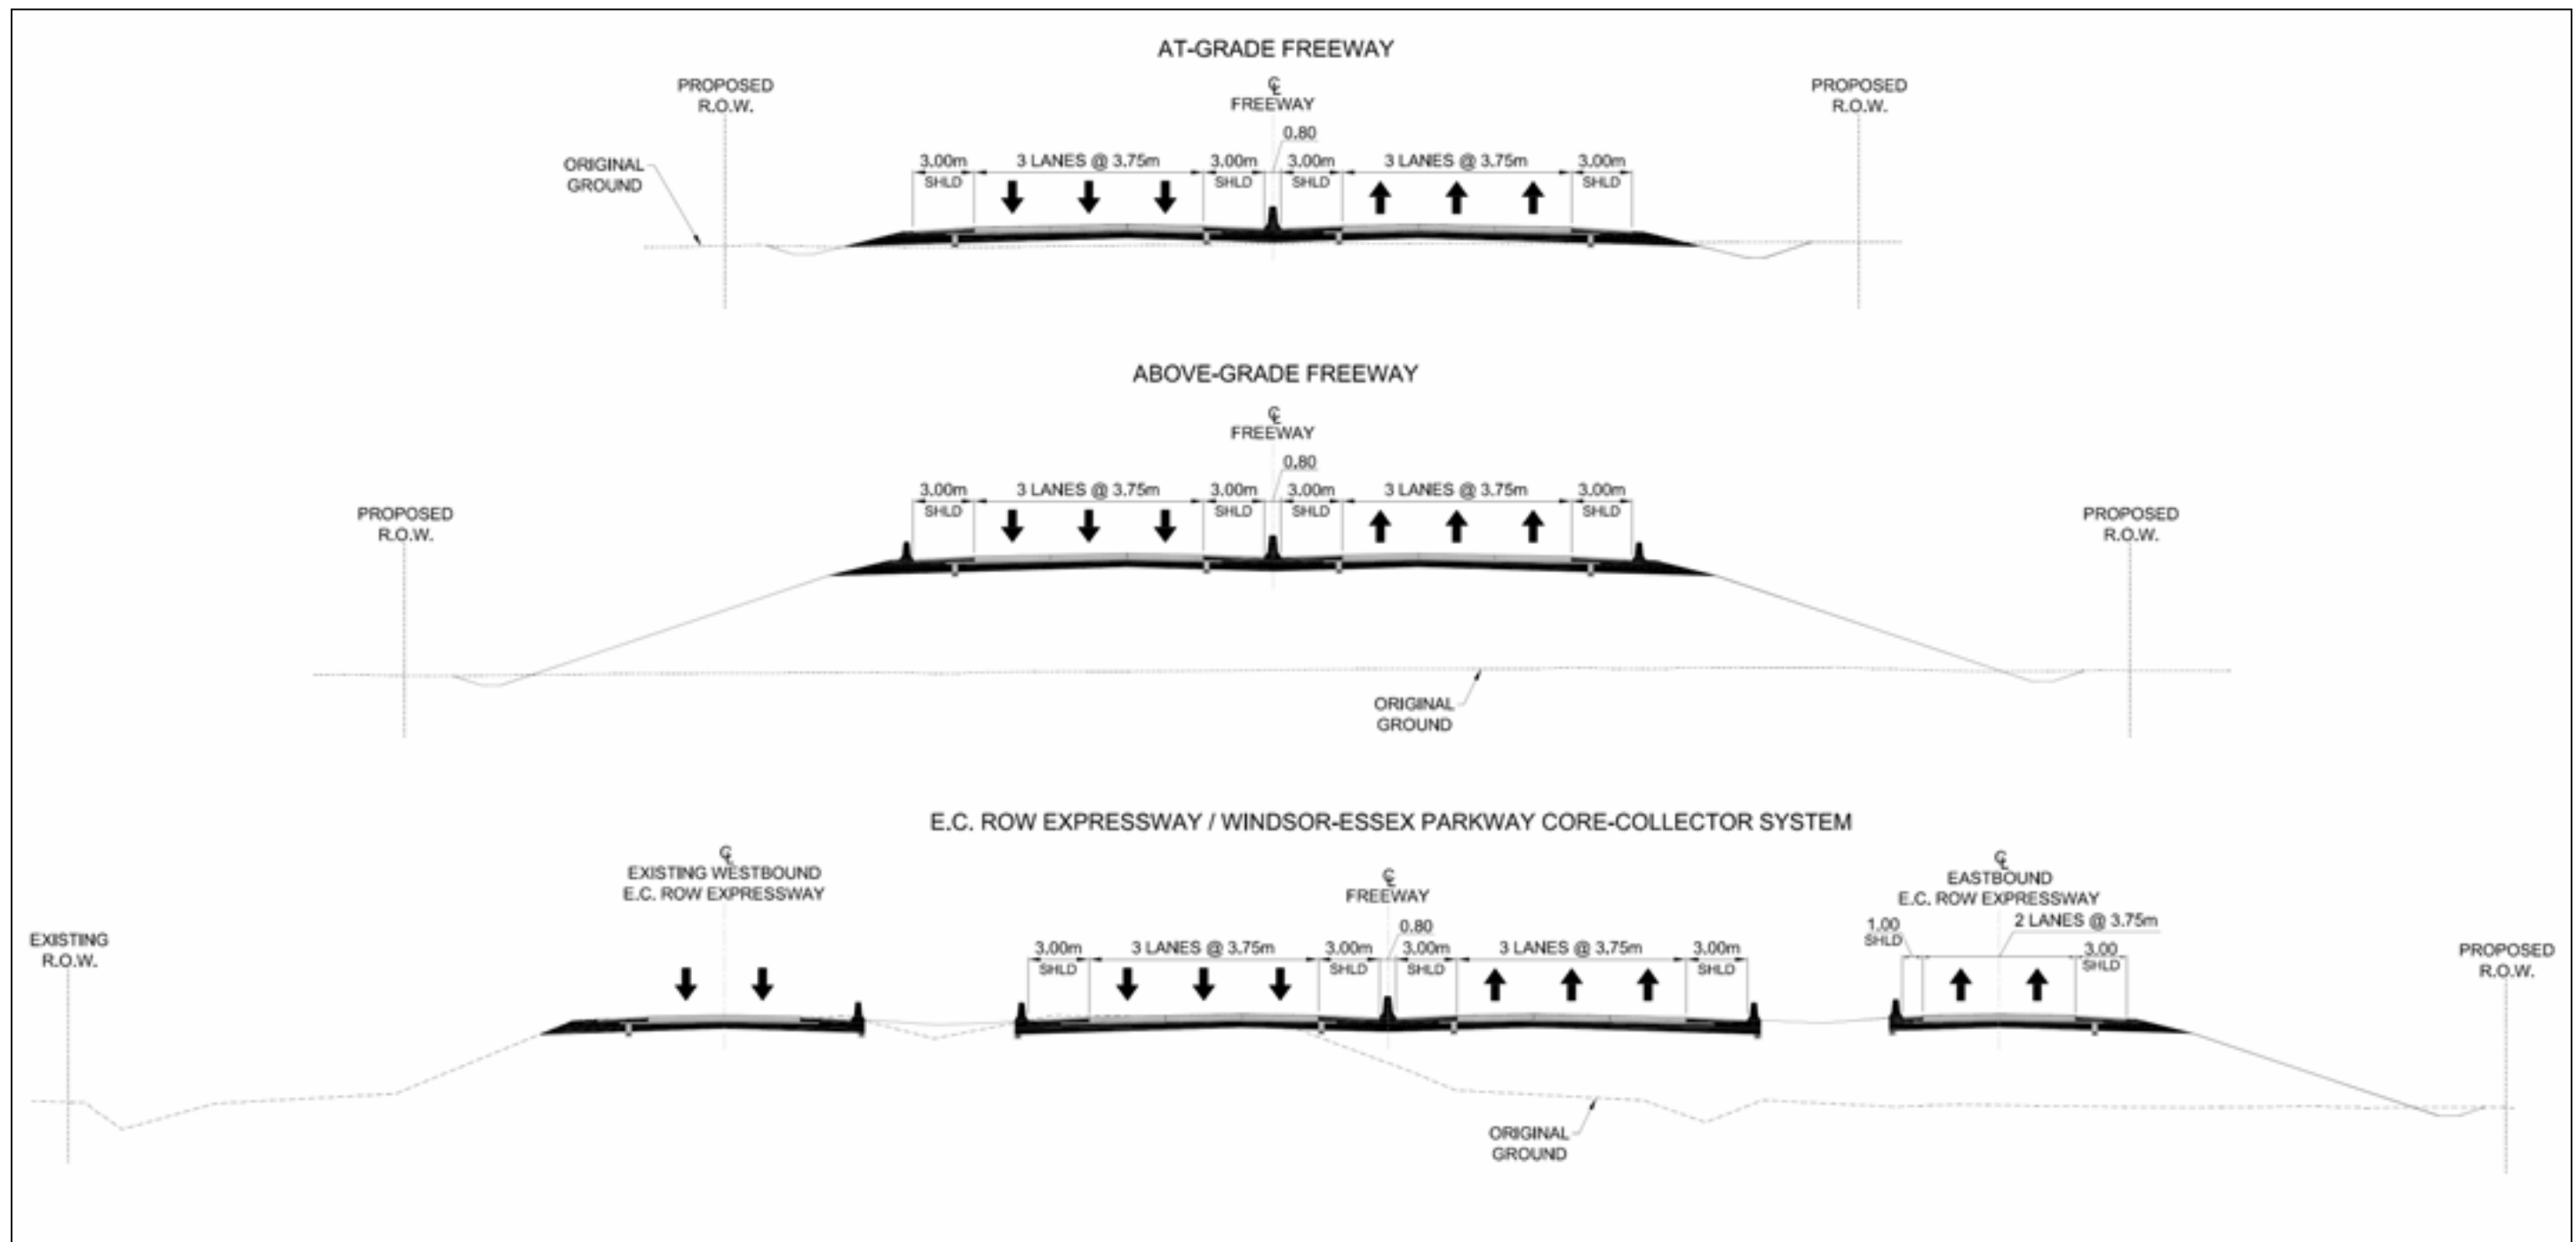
TYPICAL CROSS-SECTIONS – THE WINDSOR-ESSEX PARKWAY WITH NO SERVICE ROAD
